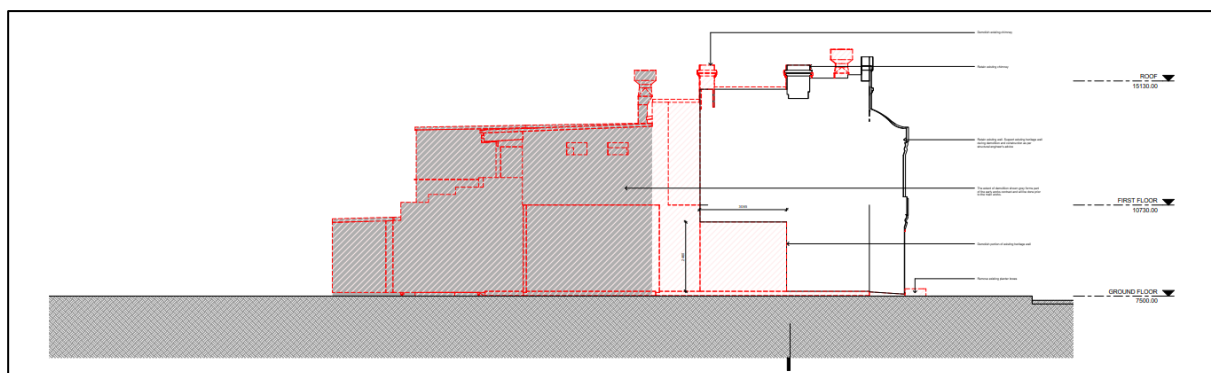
St George's Terrace west elevation demolition plan. The grey shaded area is the rear addition that was demolished as part of the early works contract in 2021 (Source: Genton, 2021).
